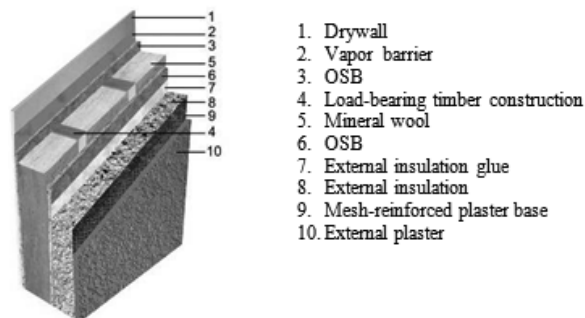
Cross-section of the prefabricated heavy timber frame wall construction. Source: [9]
